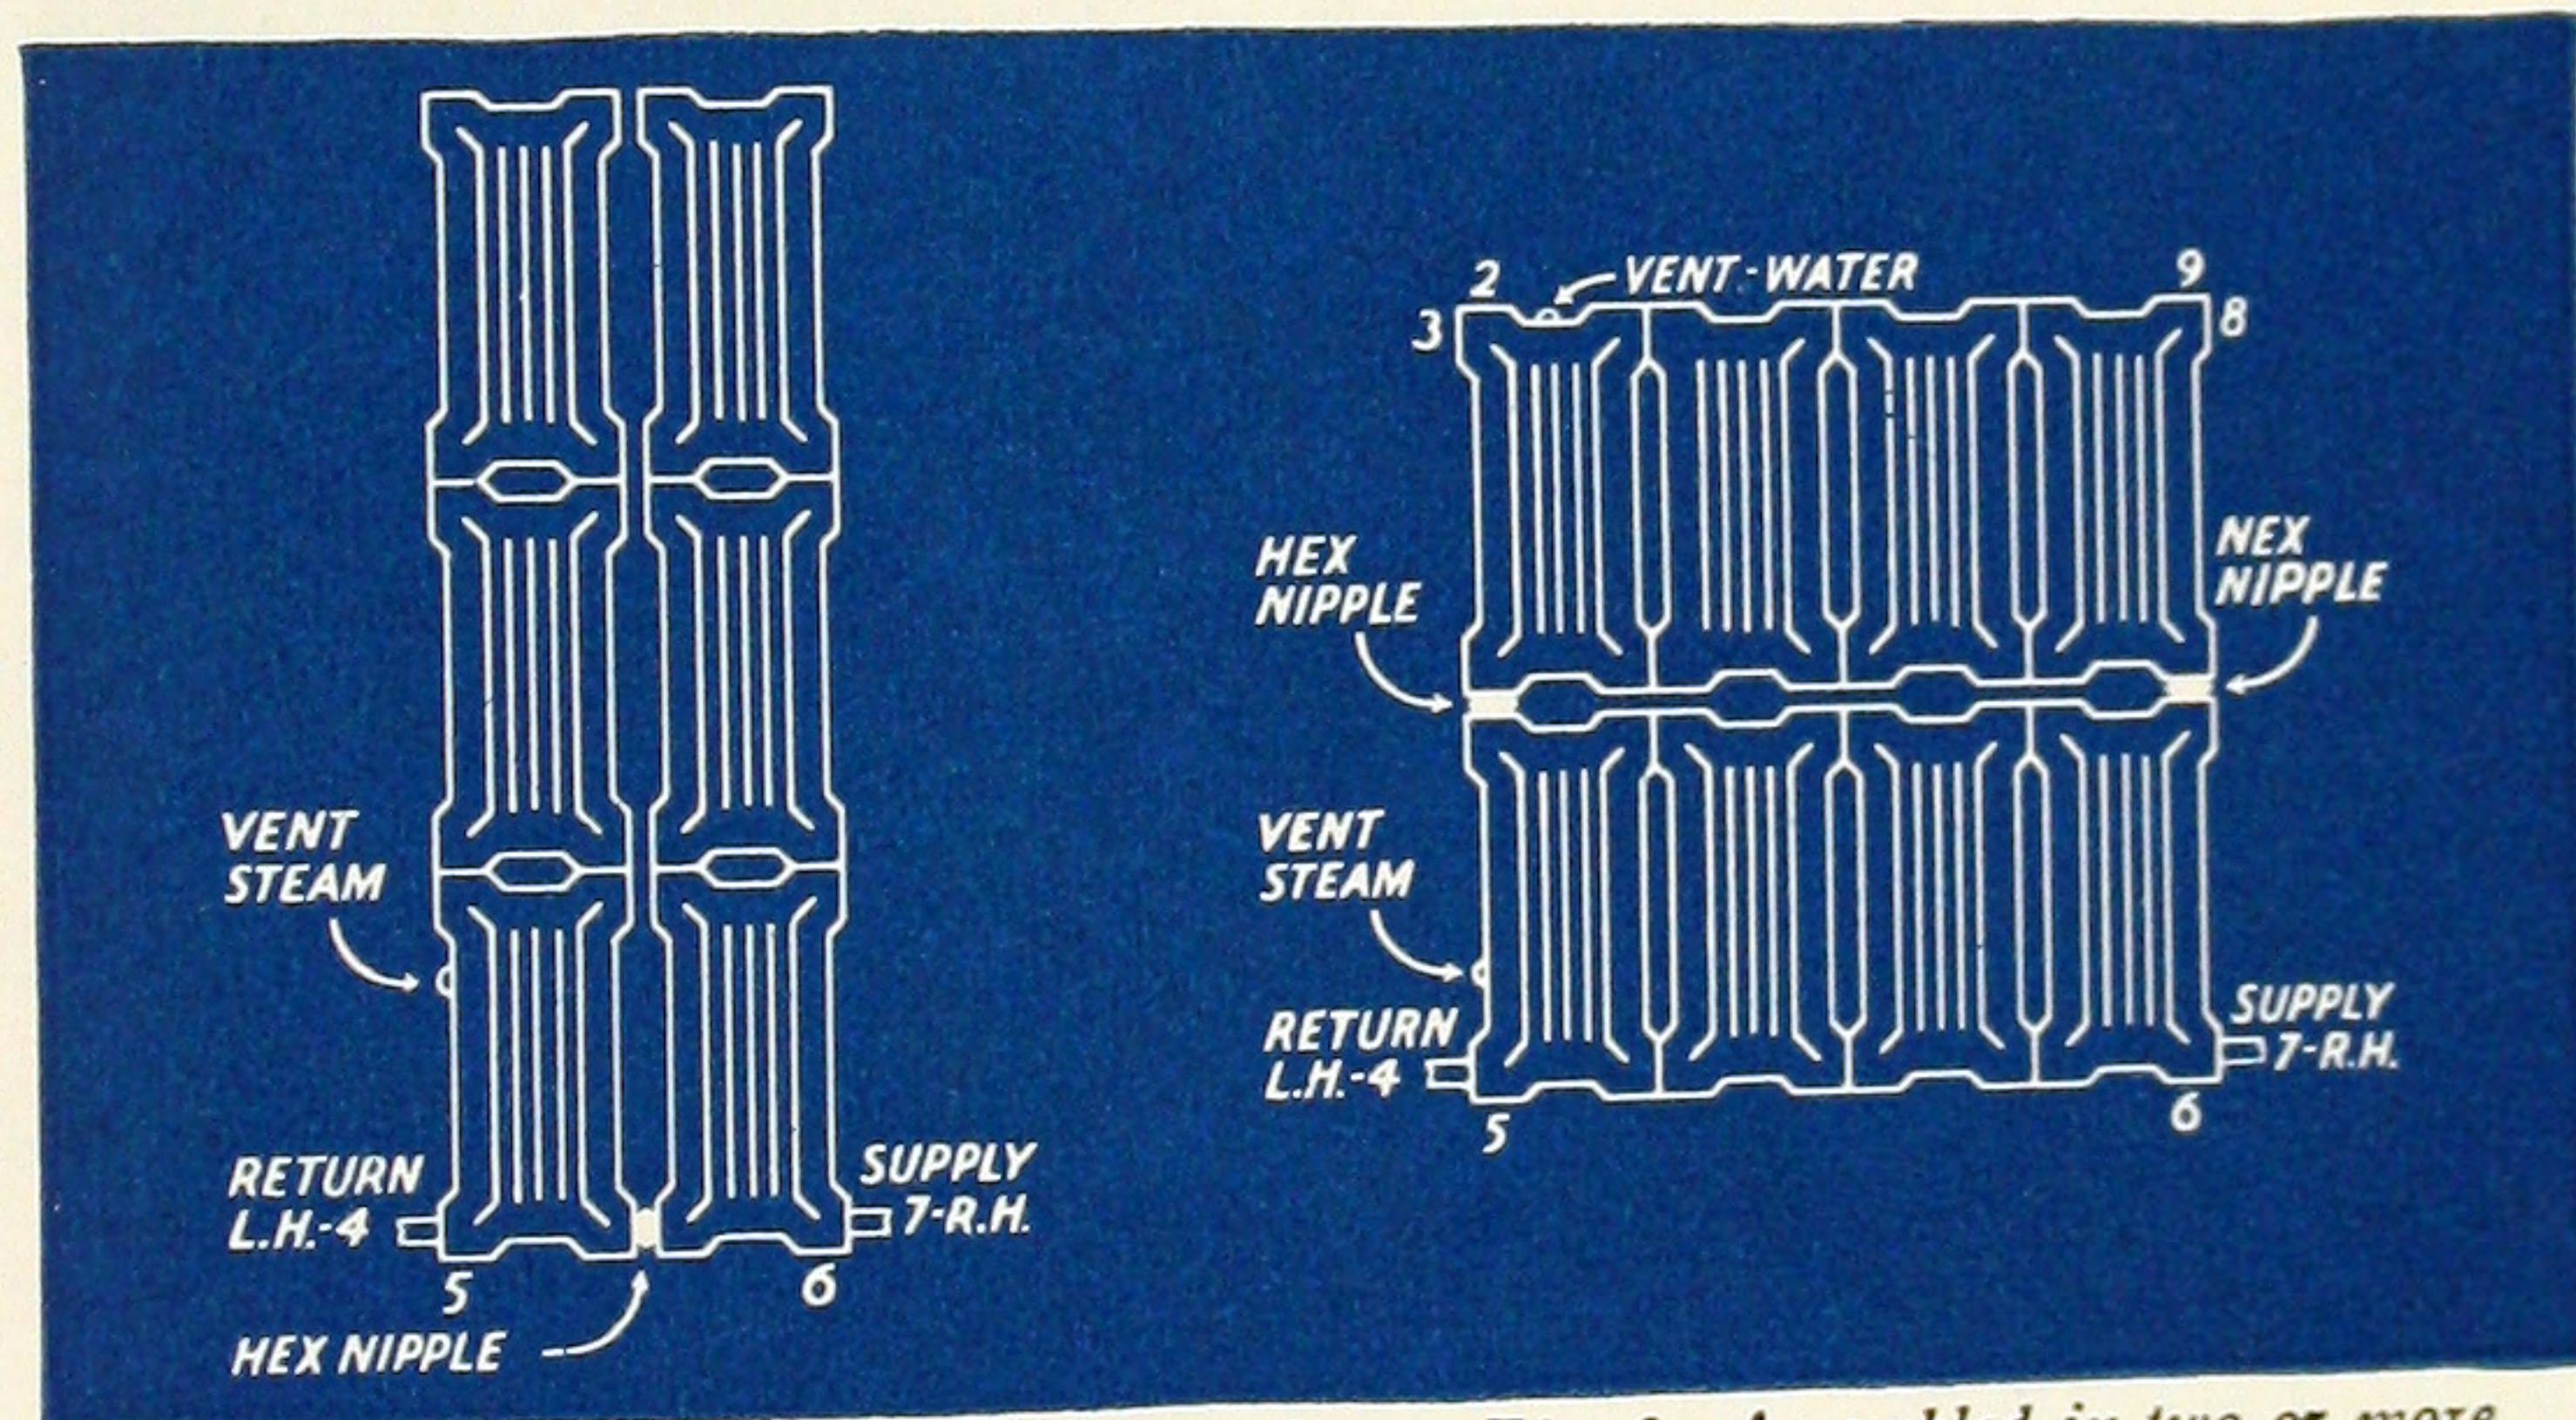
Assembled in two or more stacks. One and two pipe steam only. Bottom feed.
